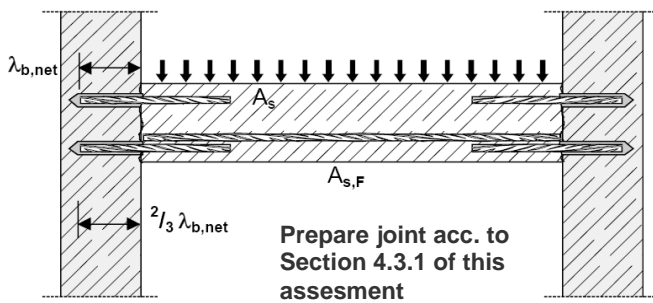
Overlap joint for rebar connections of slabs and beams
